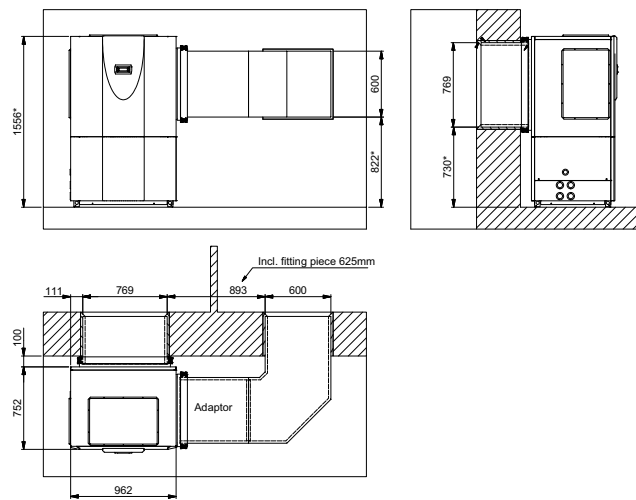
Wall installation LI 9, 12TU and LI 15TE
